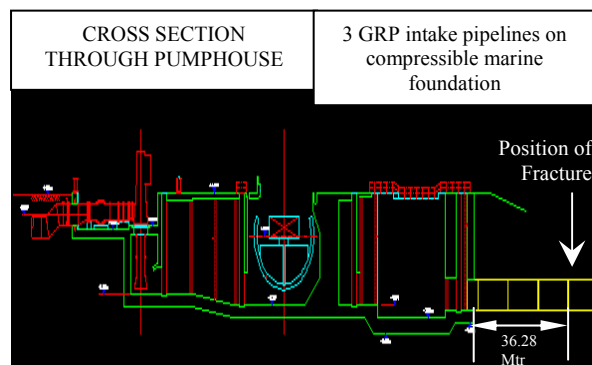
Cross section through Cooling water Pumphouse [Failure location 13xDia]
